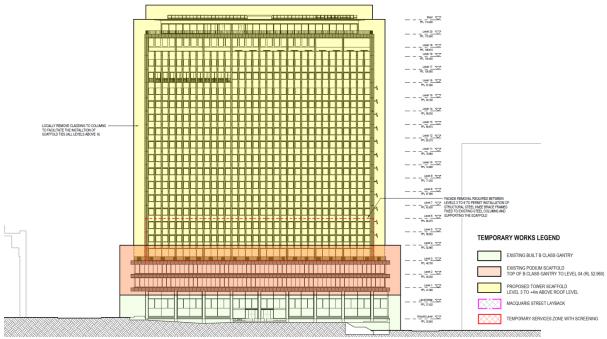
North elevation showing hoarding, scaffolding and temporary services zone with screening
